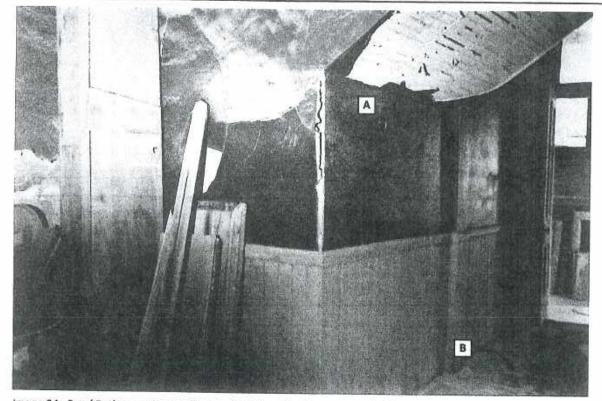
Boys' Bathroom view northeast. (A) Stair soffit of rear stairwell, (B) Disintegrating concrete.
